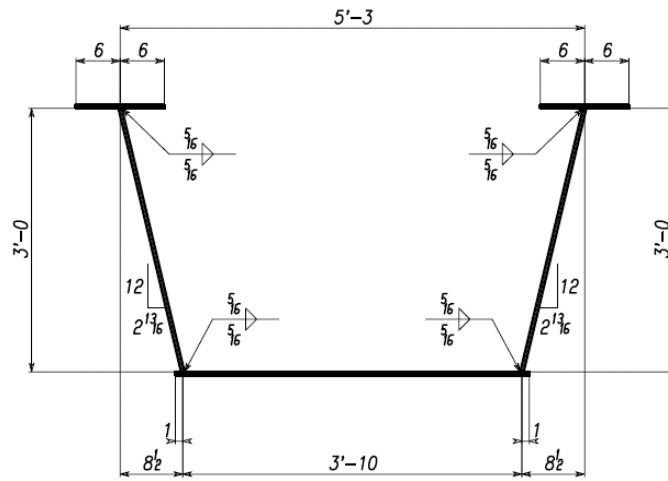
Full-Scale Baseline Tub Girder Specimen - Cross-Section
